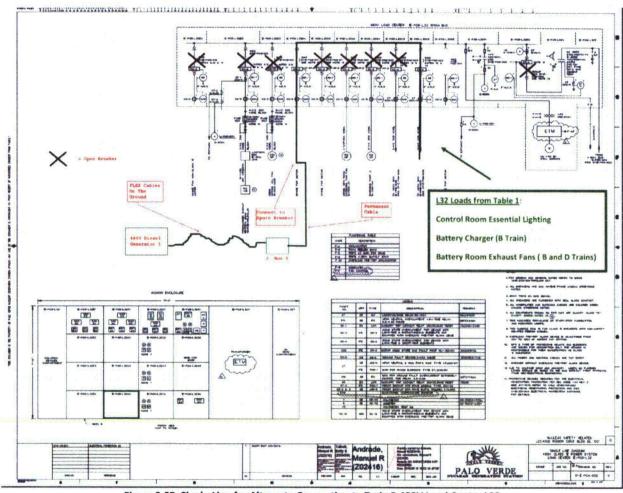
Single-Line for Alternate Connection to Train B 480V Load Center L32
